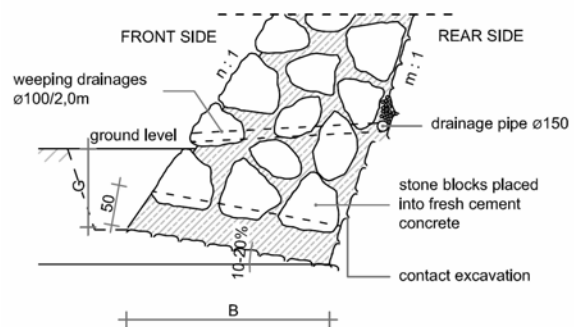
Construction detail of the concrete foundation part of a stone gravity wall
